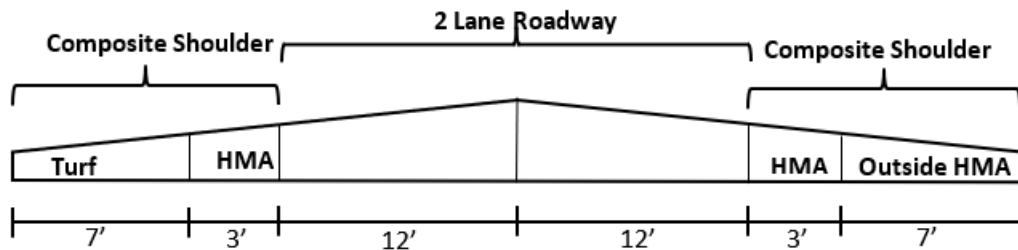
Cross Section of Pavement in Clay County, Segment One
